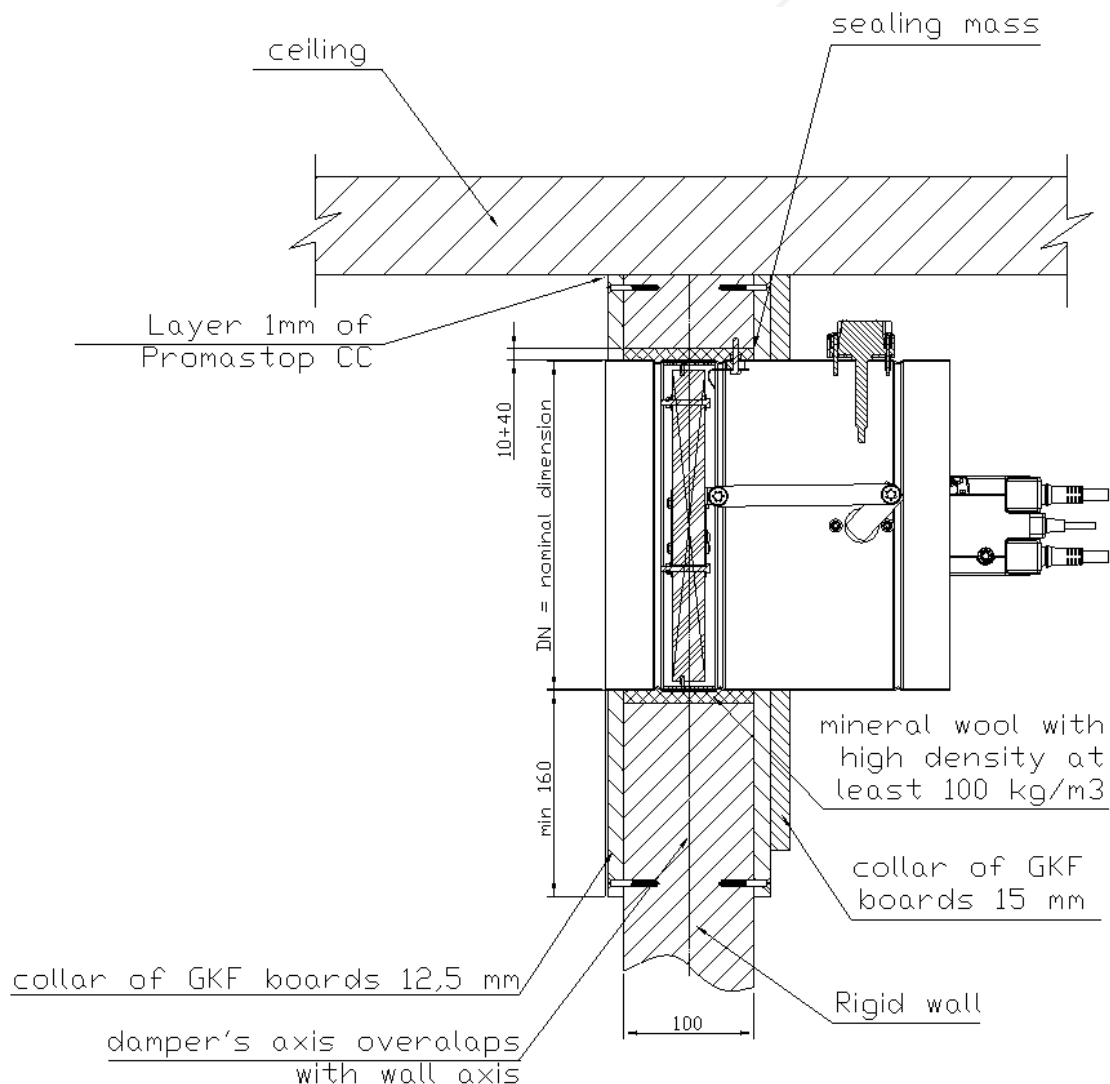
Installation method of KTM-O with minimum distances from adjacent building partition.
